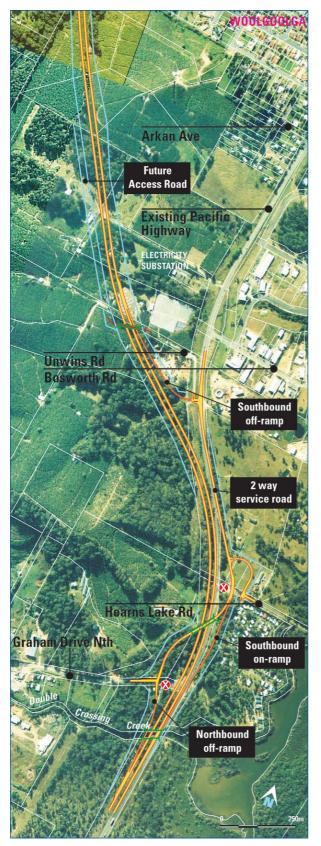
(a): Graham Drive (north) to Woolgoolga Creek Road
